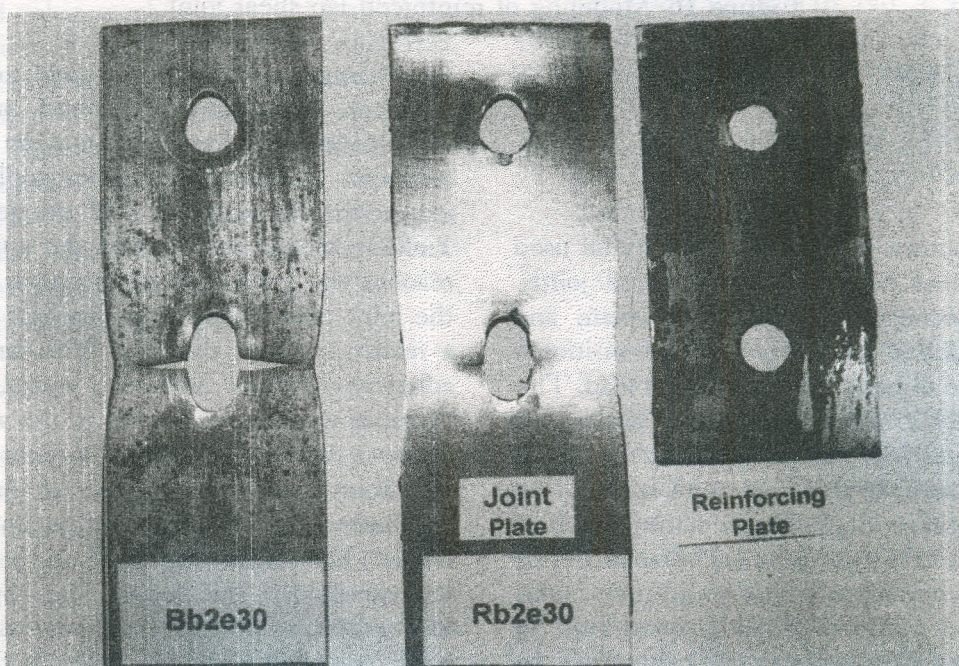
Failure of bolted and reinforced joints with 2 bolts.
